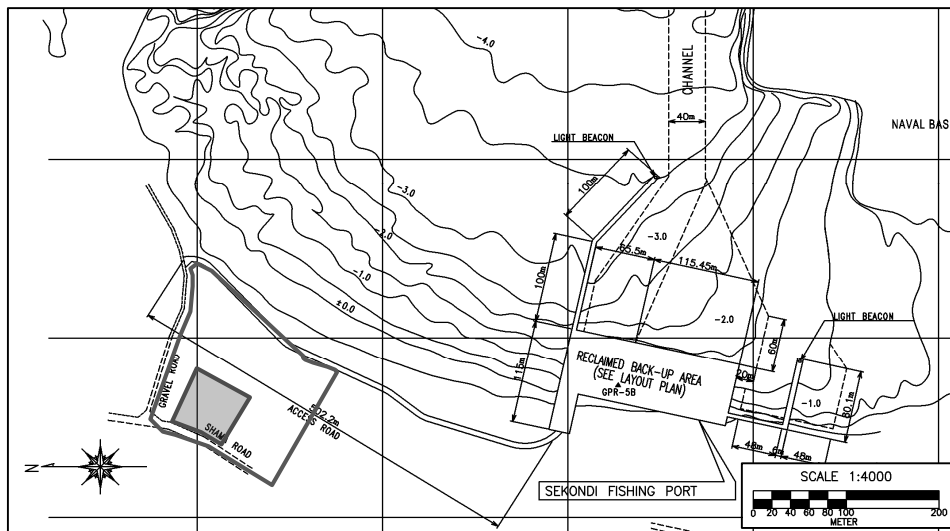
(4) Temporary Construction Yard Layout
